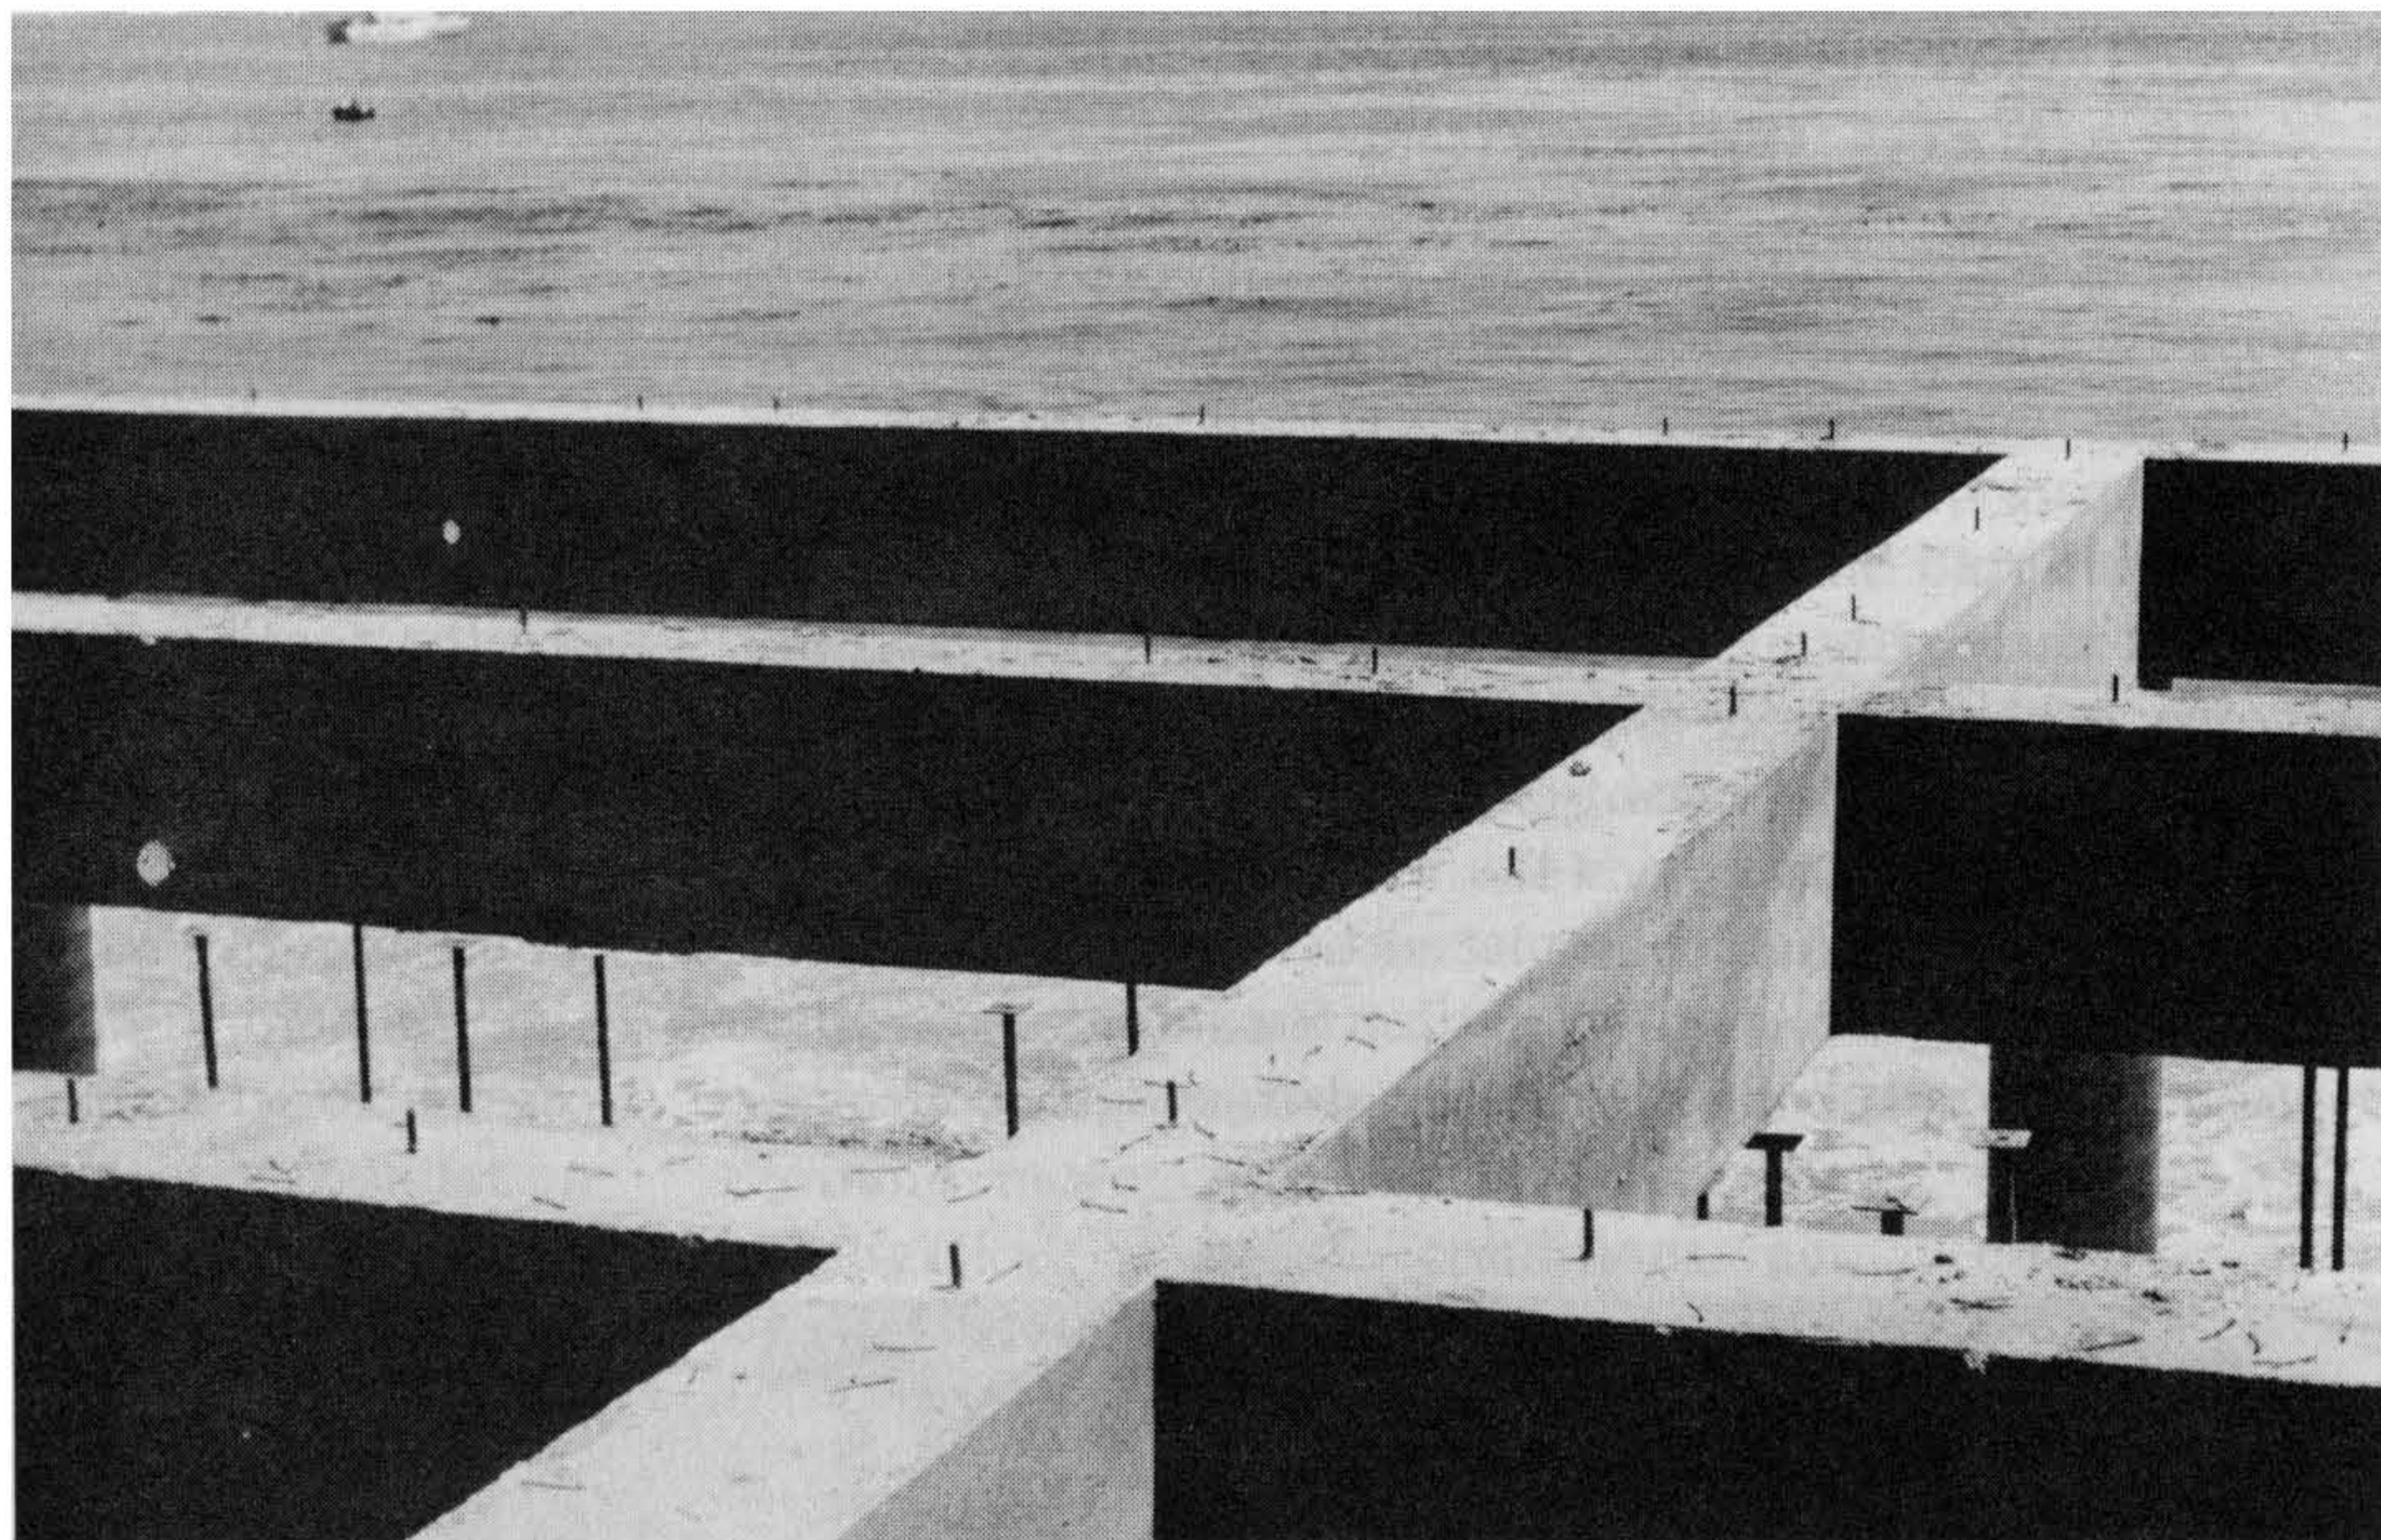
Constructing a beachfront foundation. Sonotube forms are used down-hole and also to extend caissons up to the required or finish-grade elevations. Foundations are extended down into underlying bedrock. Photograph by and courtesy of Frank E. Denison, geologist.
